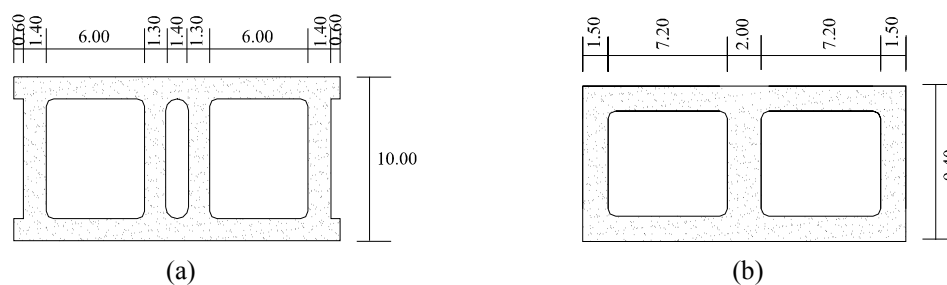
Lightweight concrete masonry walls; (a) unconfined walls; (b) confined walls
